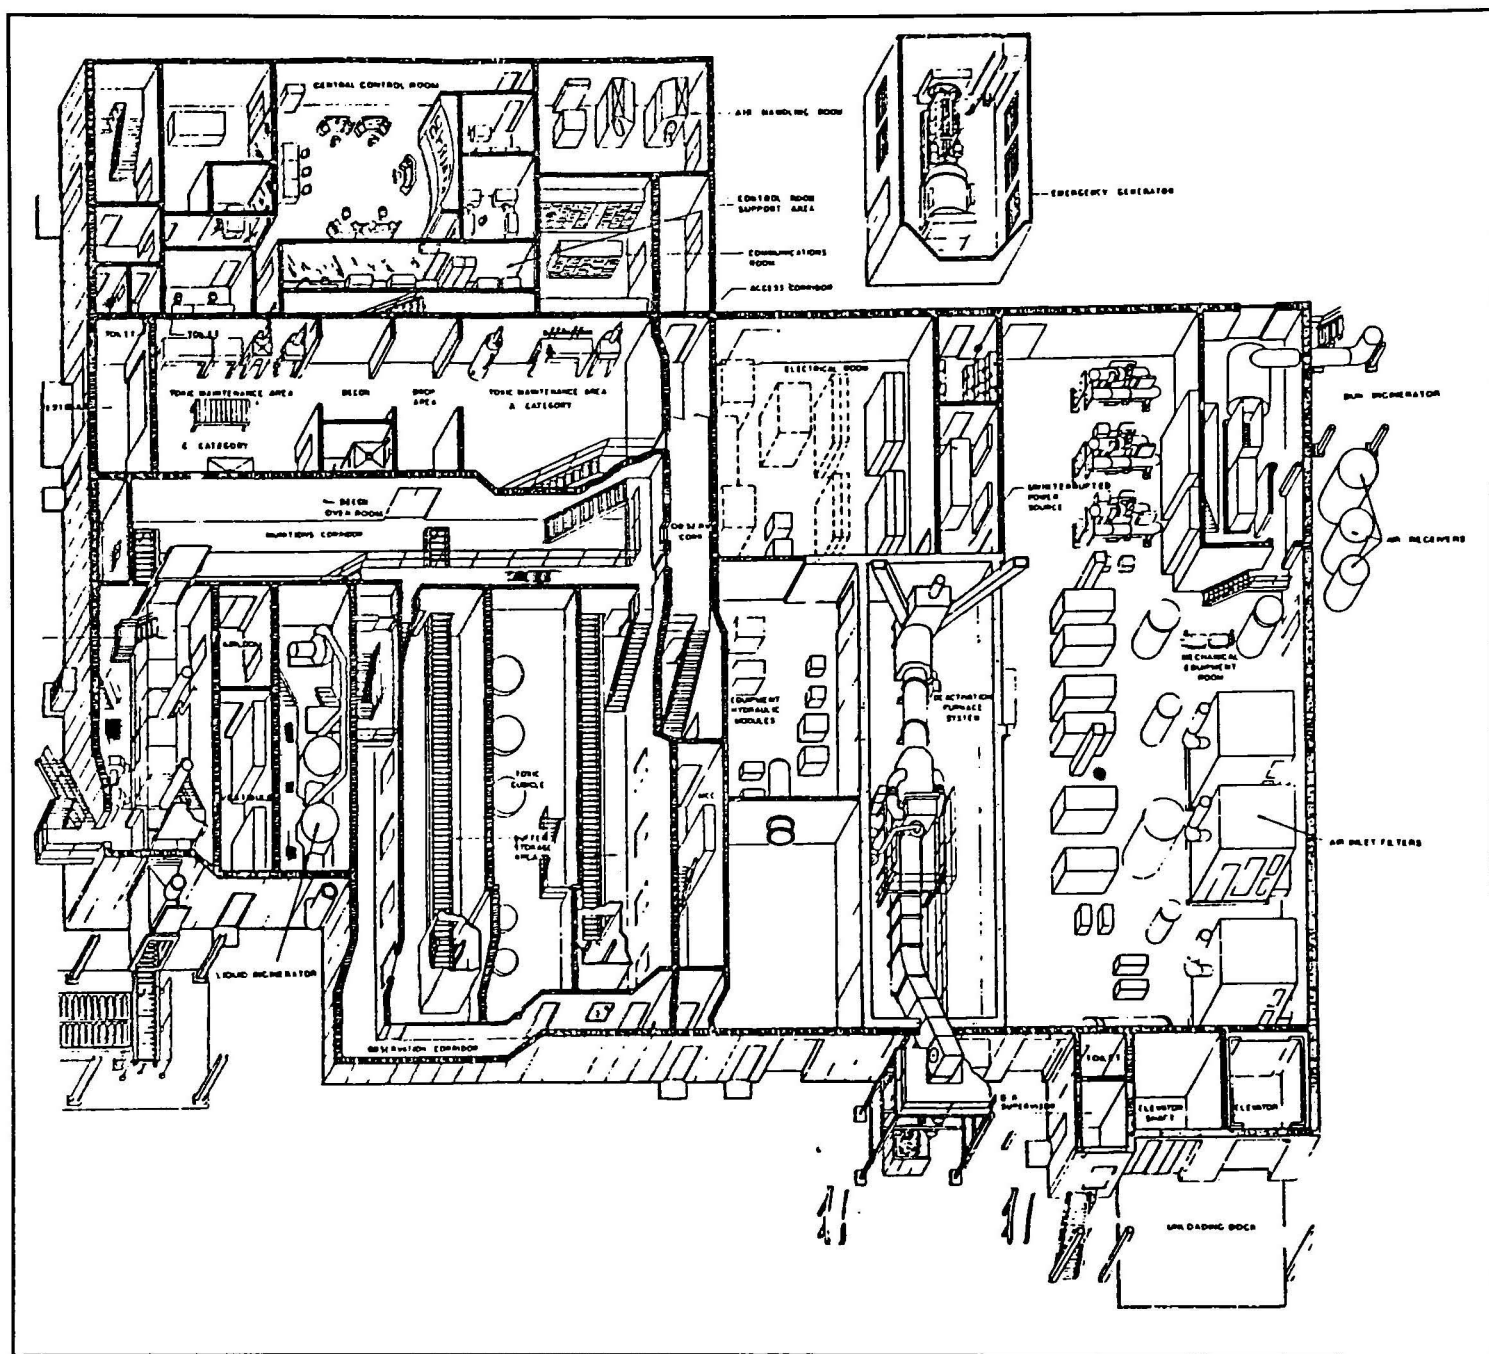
JACADS Munitions Demilitarization Building, First Floor
